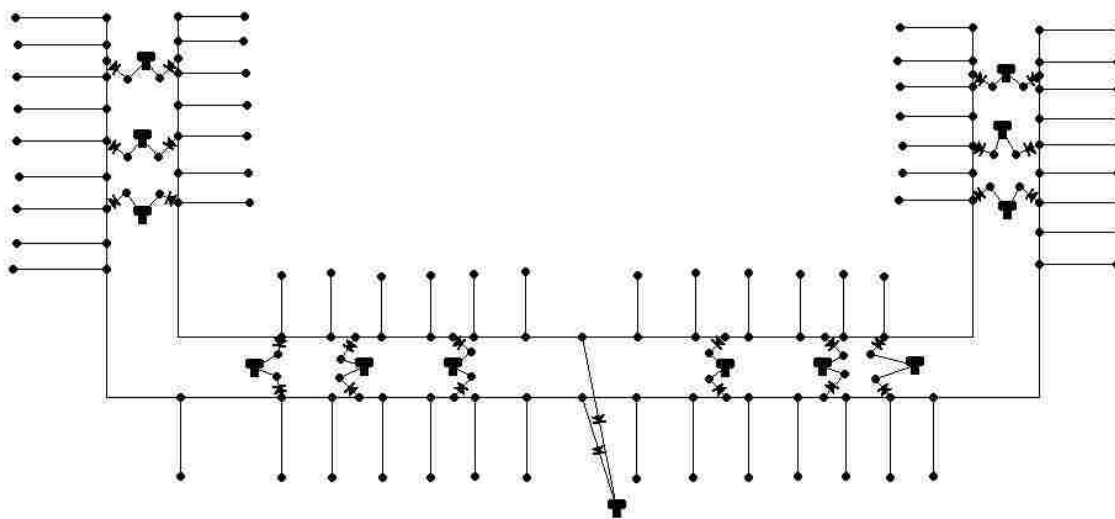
Layout of Collection System for Apartment Rainwater Harvesting
